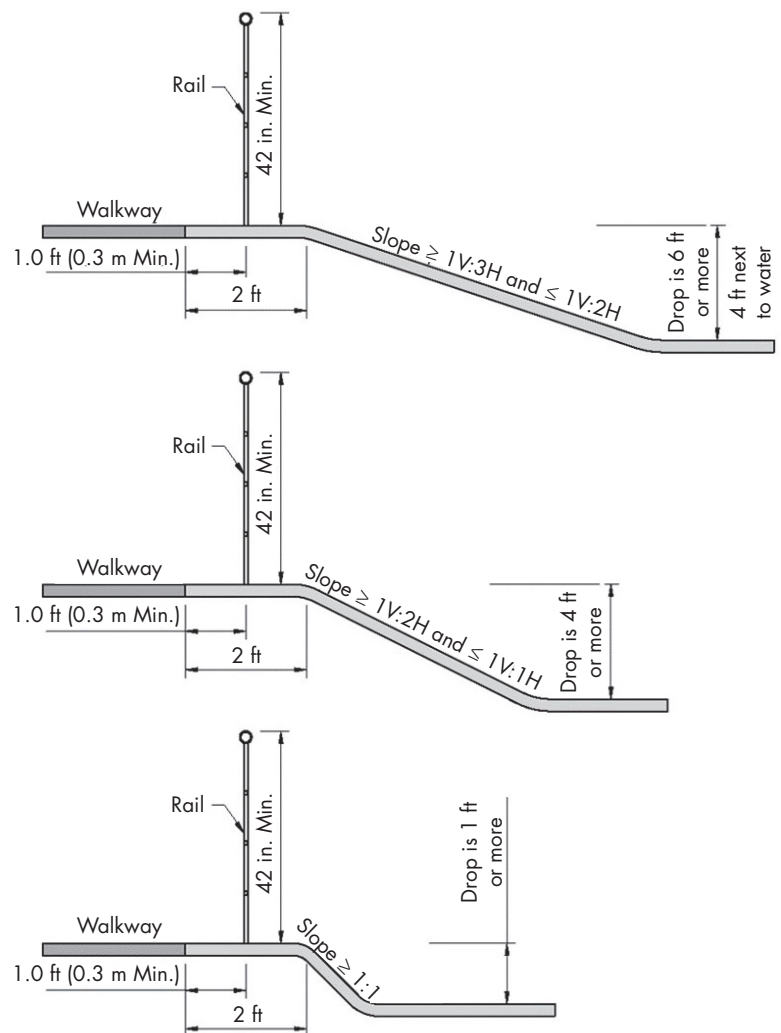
Pedestrian Rail between Walkway and Adjacent Slope (Florida DOT, 1999)
